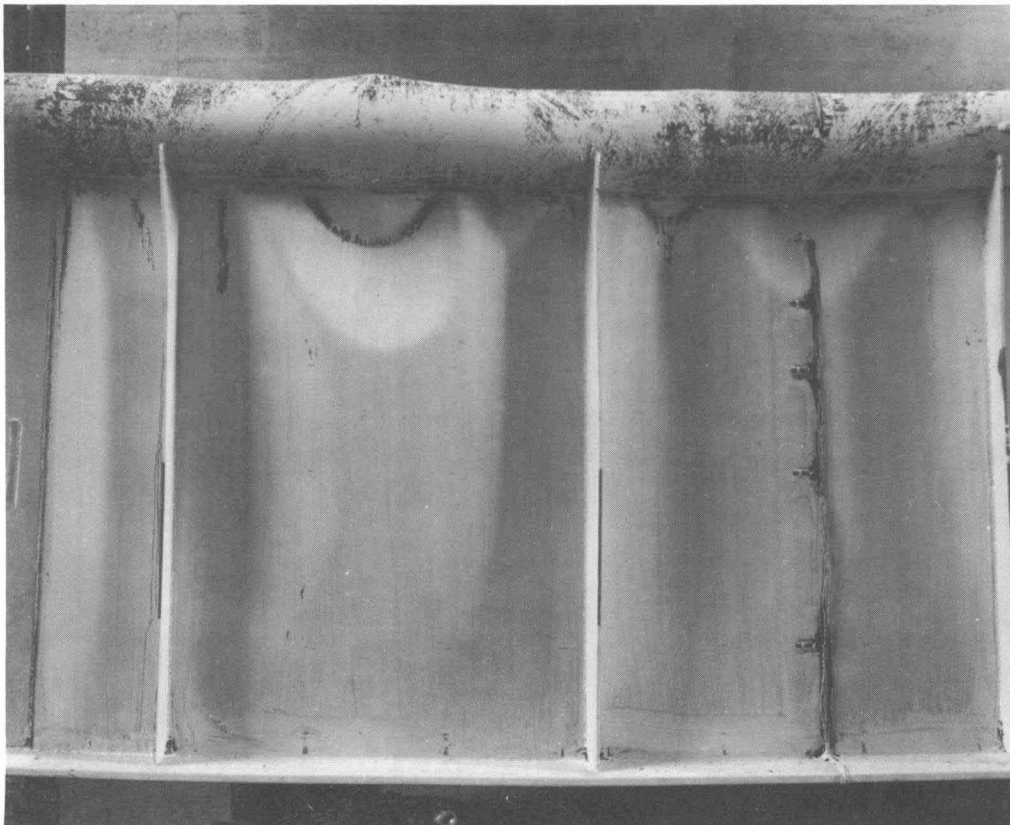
Failure of Girder G5, Test T2
